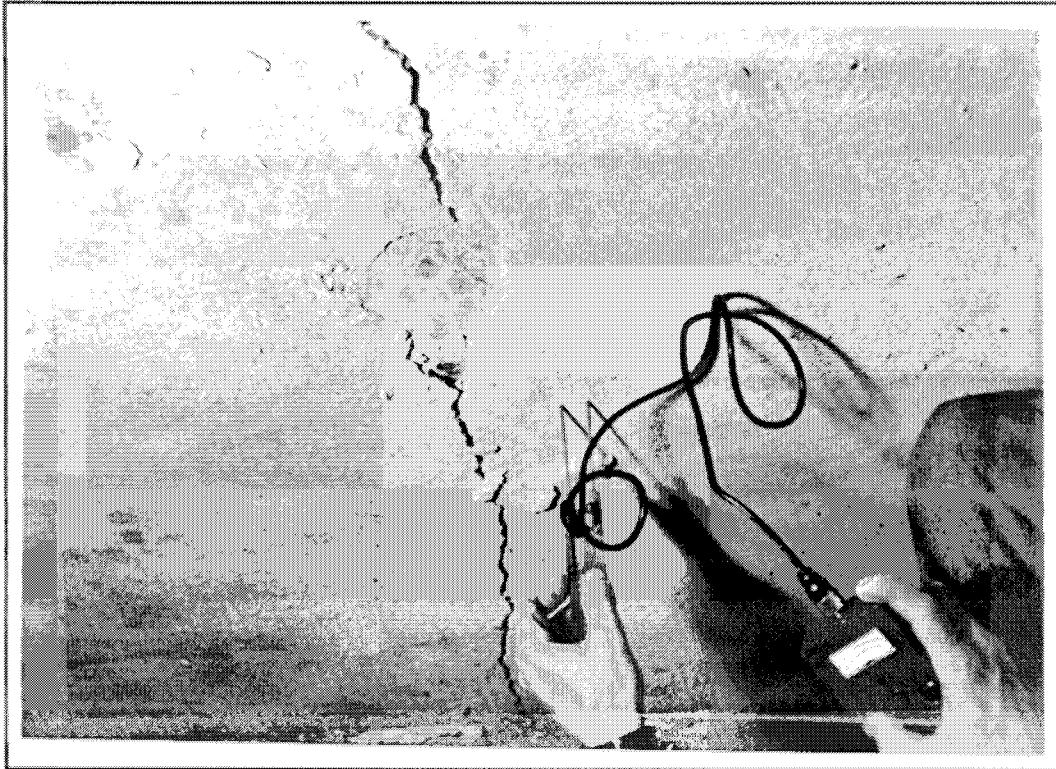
Crack in Thin Concrete Revealing Poly
